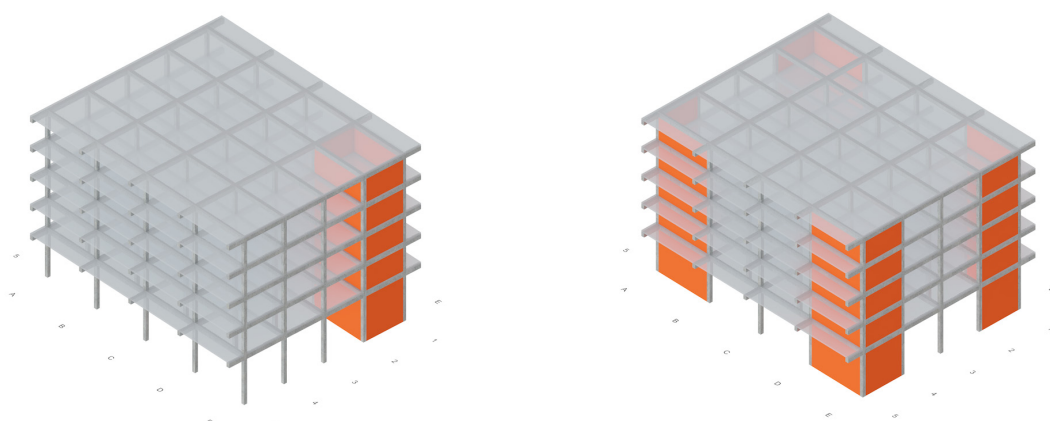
Shear walls applied as a building core (left image) and at the corners frames of the structure (right image) (author's own work)
